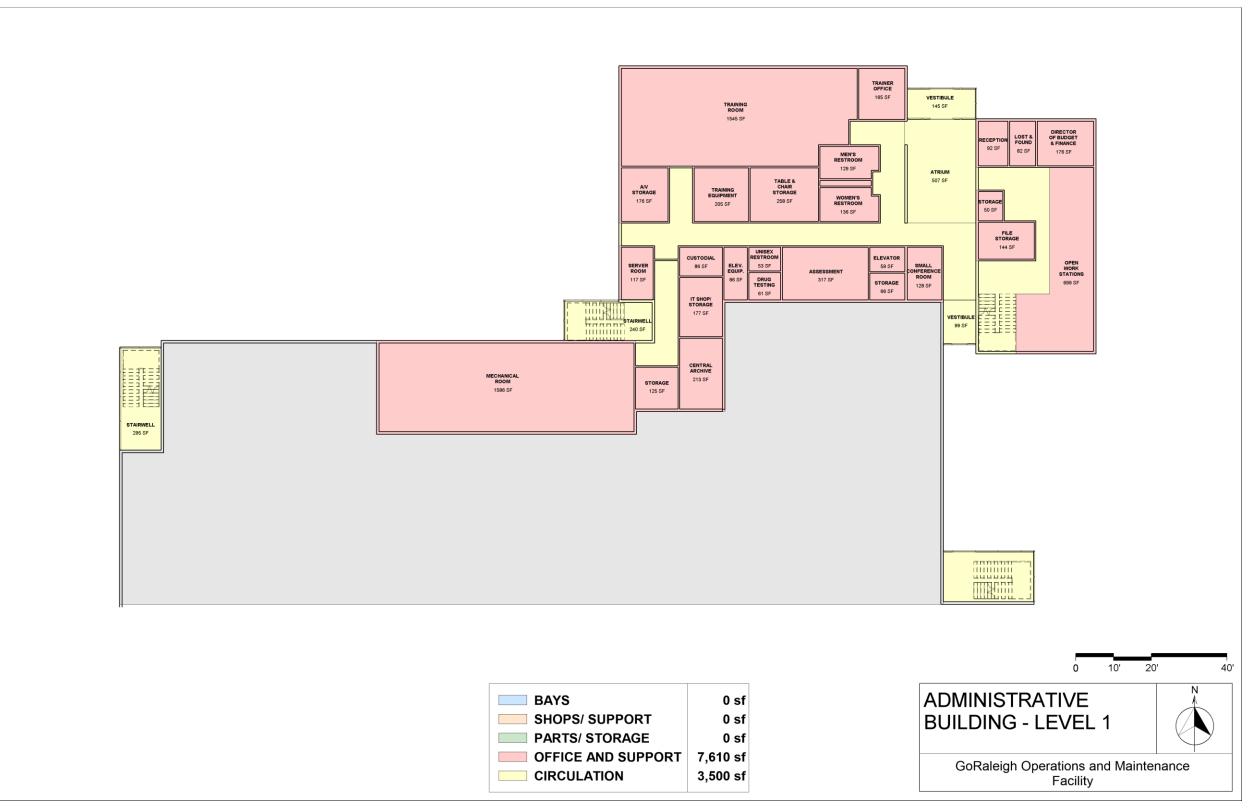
#### Exhibit V: GoRaleigh Operations and Maintenance Facility Site Plan
